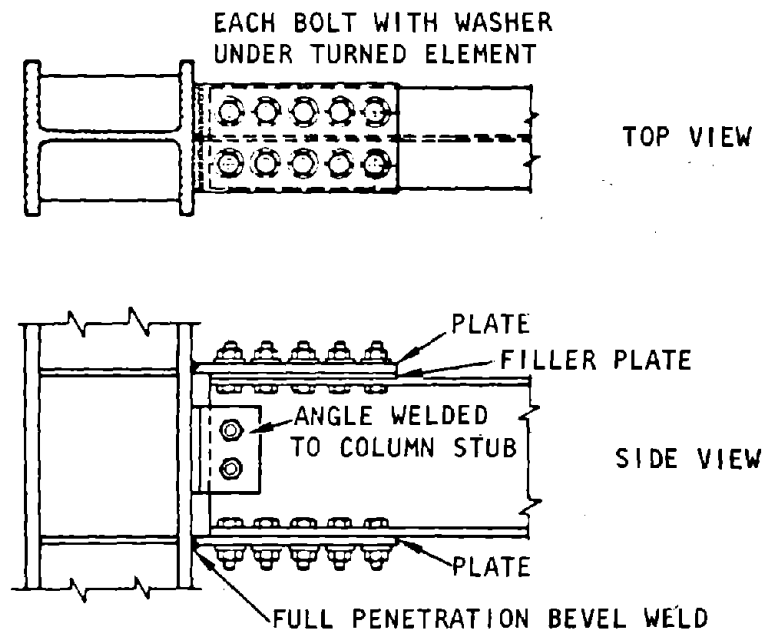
Alternative Beam-Column Connection, Type III (Popov-Pinkney, 1968)
